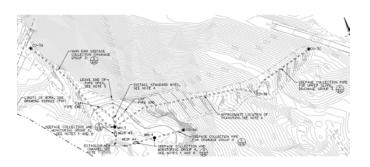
Subdrain Plan, East Dam and Main Dam Reaches.
